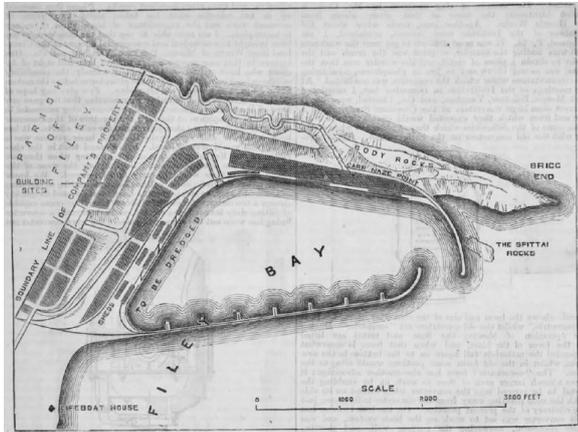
Proposed harbour, Filey, extending north of Church Ravine ('The Engineer', Nov 19th, 1880)
